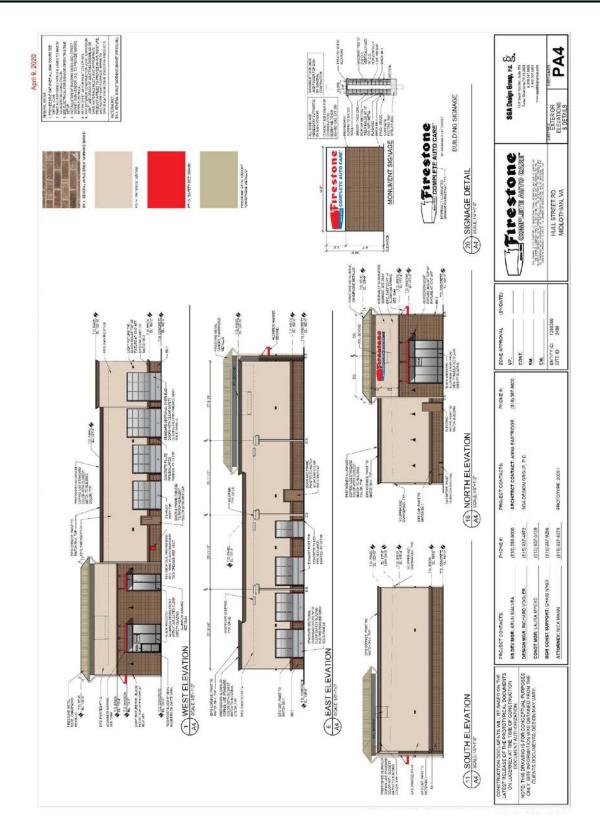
EXHIBIT A – SITE PLANS AND ELEVATIONS Last Revised April 10, 2020
